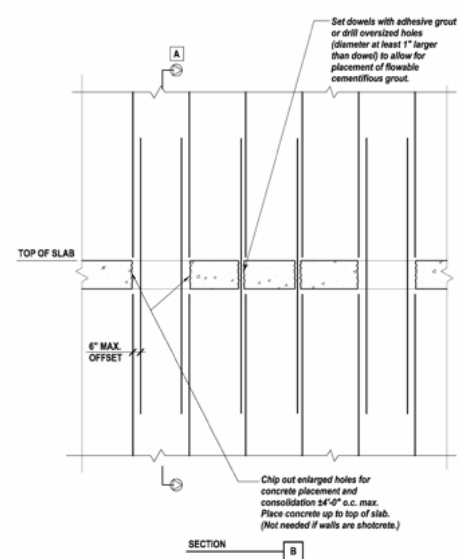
B: Concrete Wall Connection to Concrete Slab - Partial Elevation View
